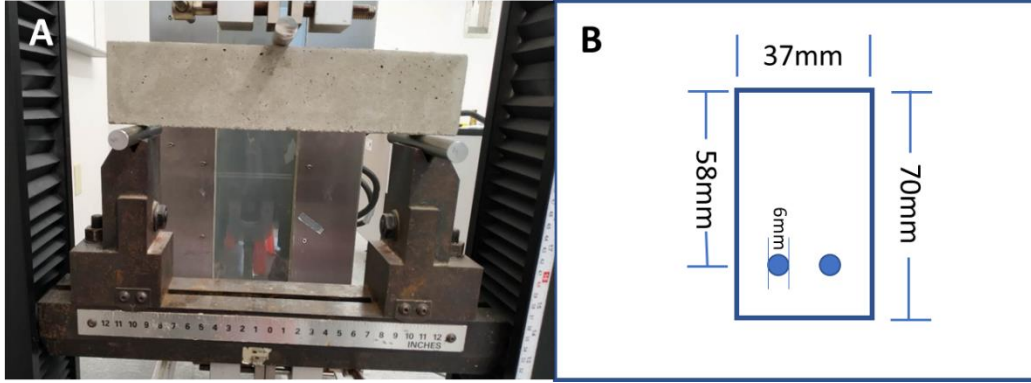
(A) Three-point bending test setup for the FRP rebar reinforced concrete beam. (B) The dimension of the concrete beam.
